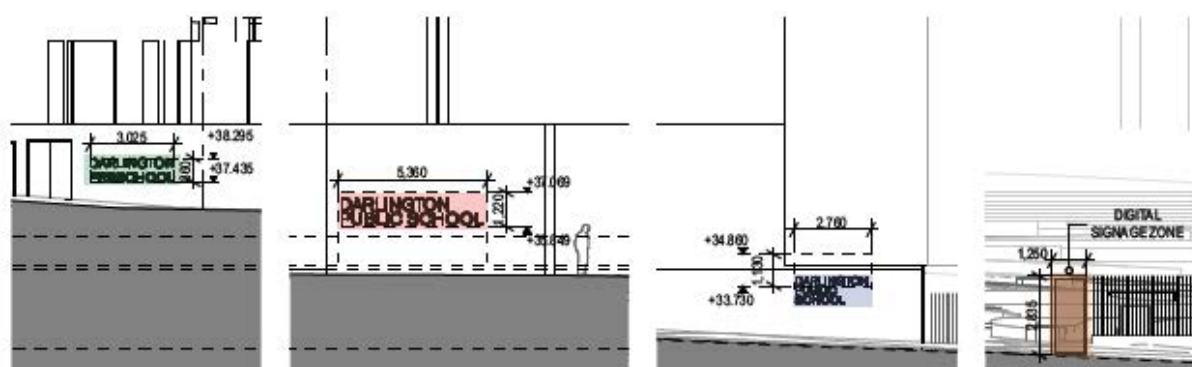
Elevation—signage. (Source: FJMT 2010, plan 3300)
